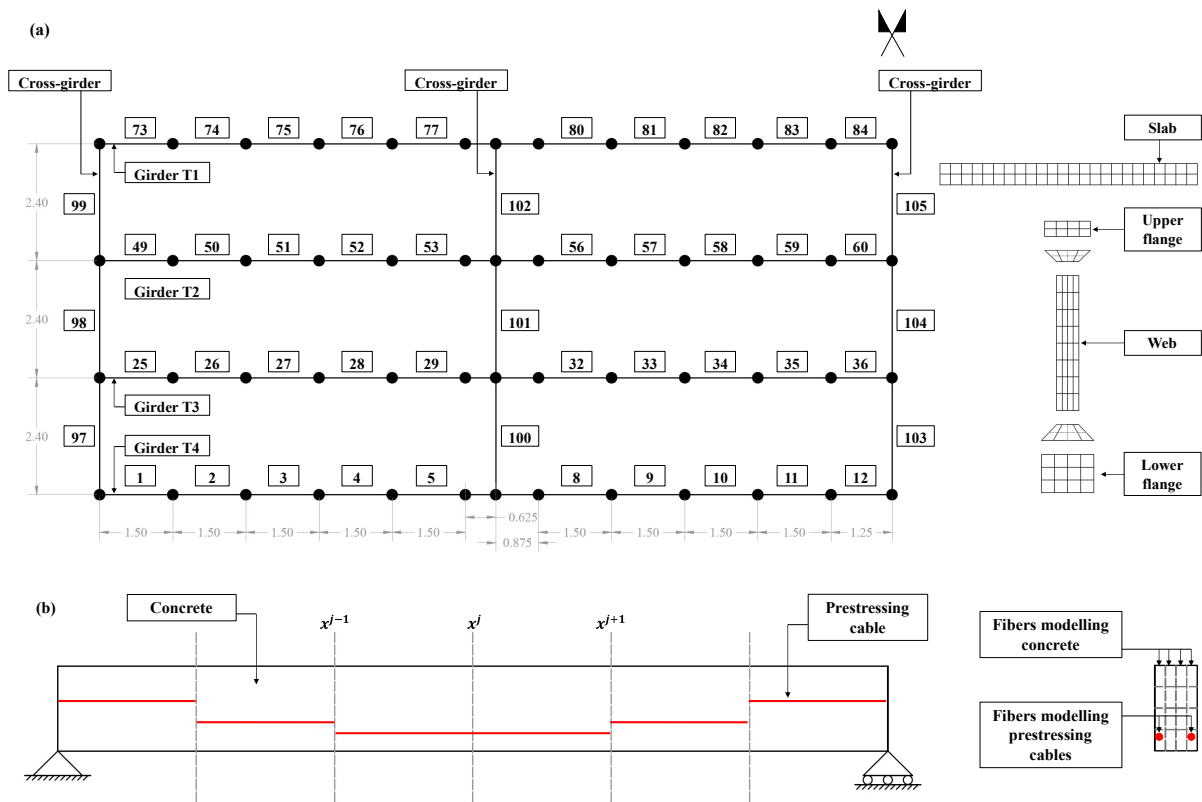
a) Discretisation of (a) the bridge span and girders and (b) the prestressing cables in frame finite elements with fibre section
